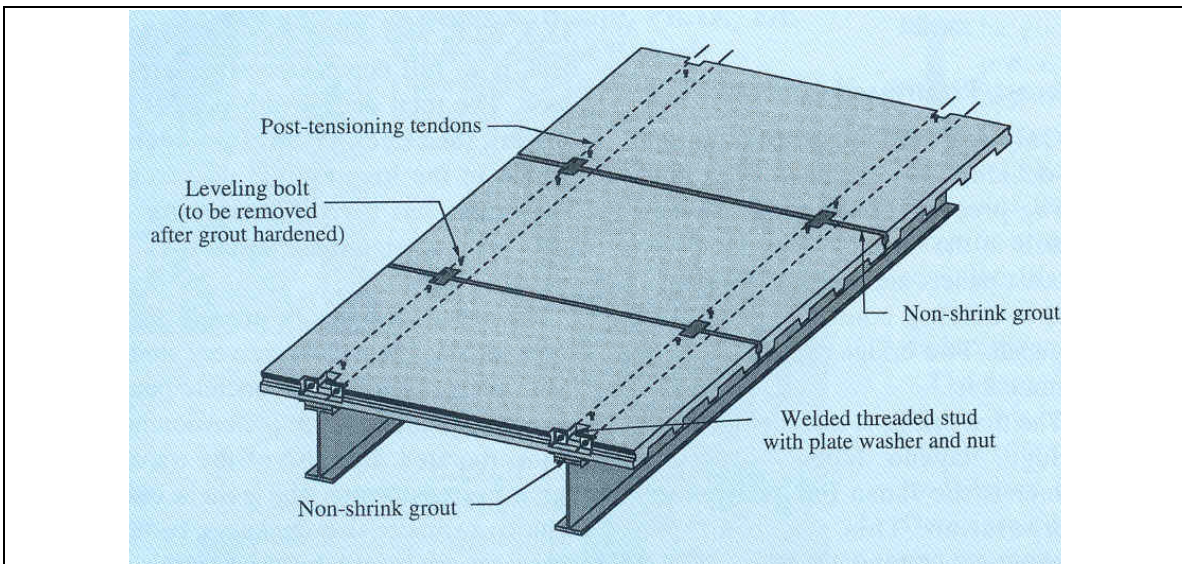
Full-depth precast, prestressed deck system developed under NCHRP Project 12-41 (Yamane et al., 1998)
